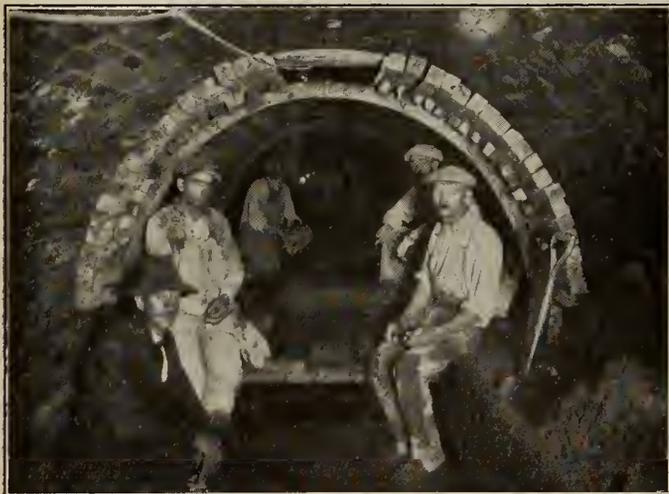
Meeting of Two Headings on 6-foot Sewer in Greenwood Avenue Tunnel.
